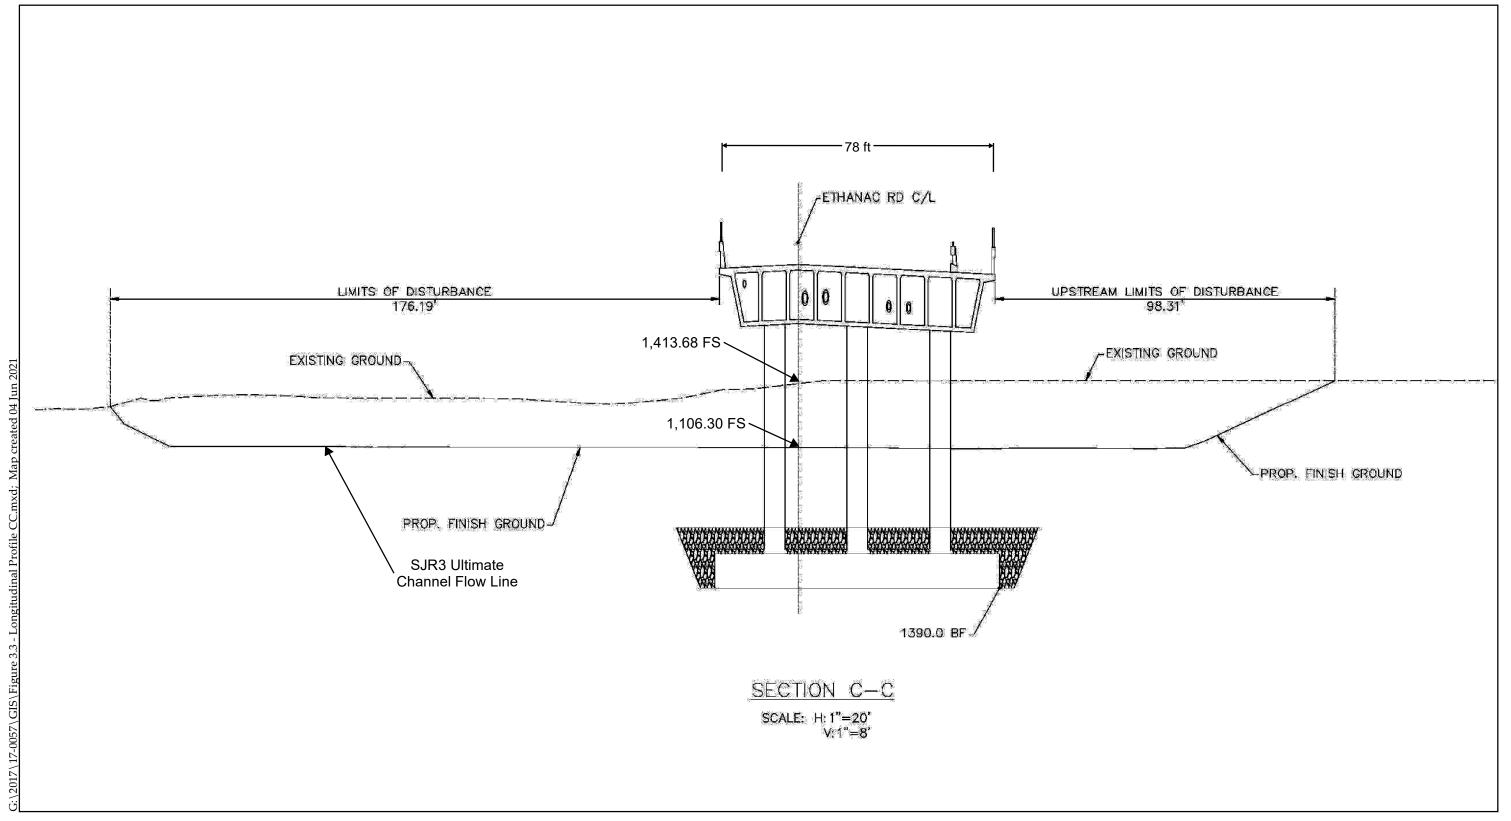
Section C-C - Bridge Longitudinal Profile
